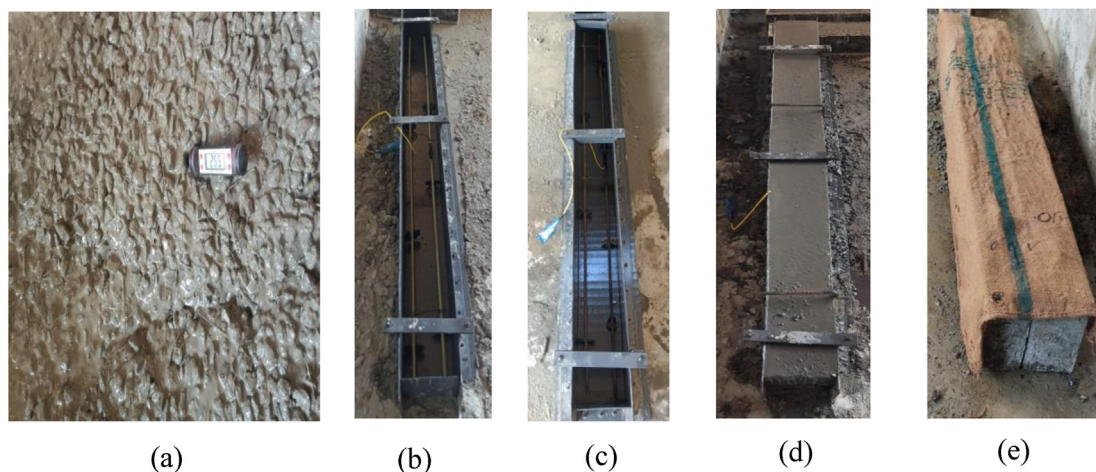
Specimen preparation: (a) Fresh concrete and its temperature recording, (b) Fiber reinforcement form, (c) Steel reinforcement form, (d) Fully cast specimen, (e) Beams curing with wet burlap.
